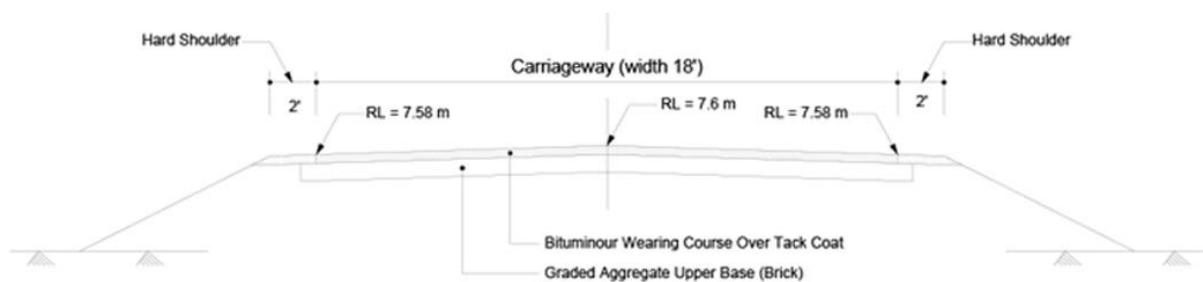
Cross section of Dhulivita road (Source: Dhamrai Pourashava Survey report)
